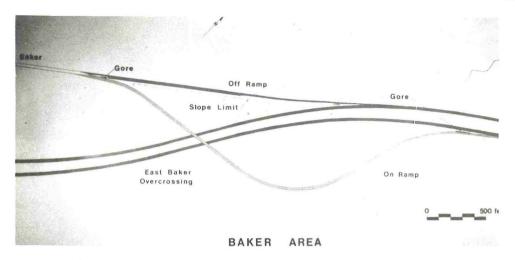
Plan view of the east Baker freeway interchange where existing roadway was used for the exit ramp.
